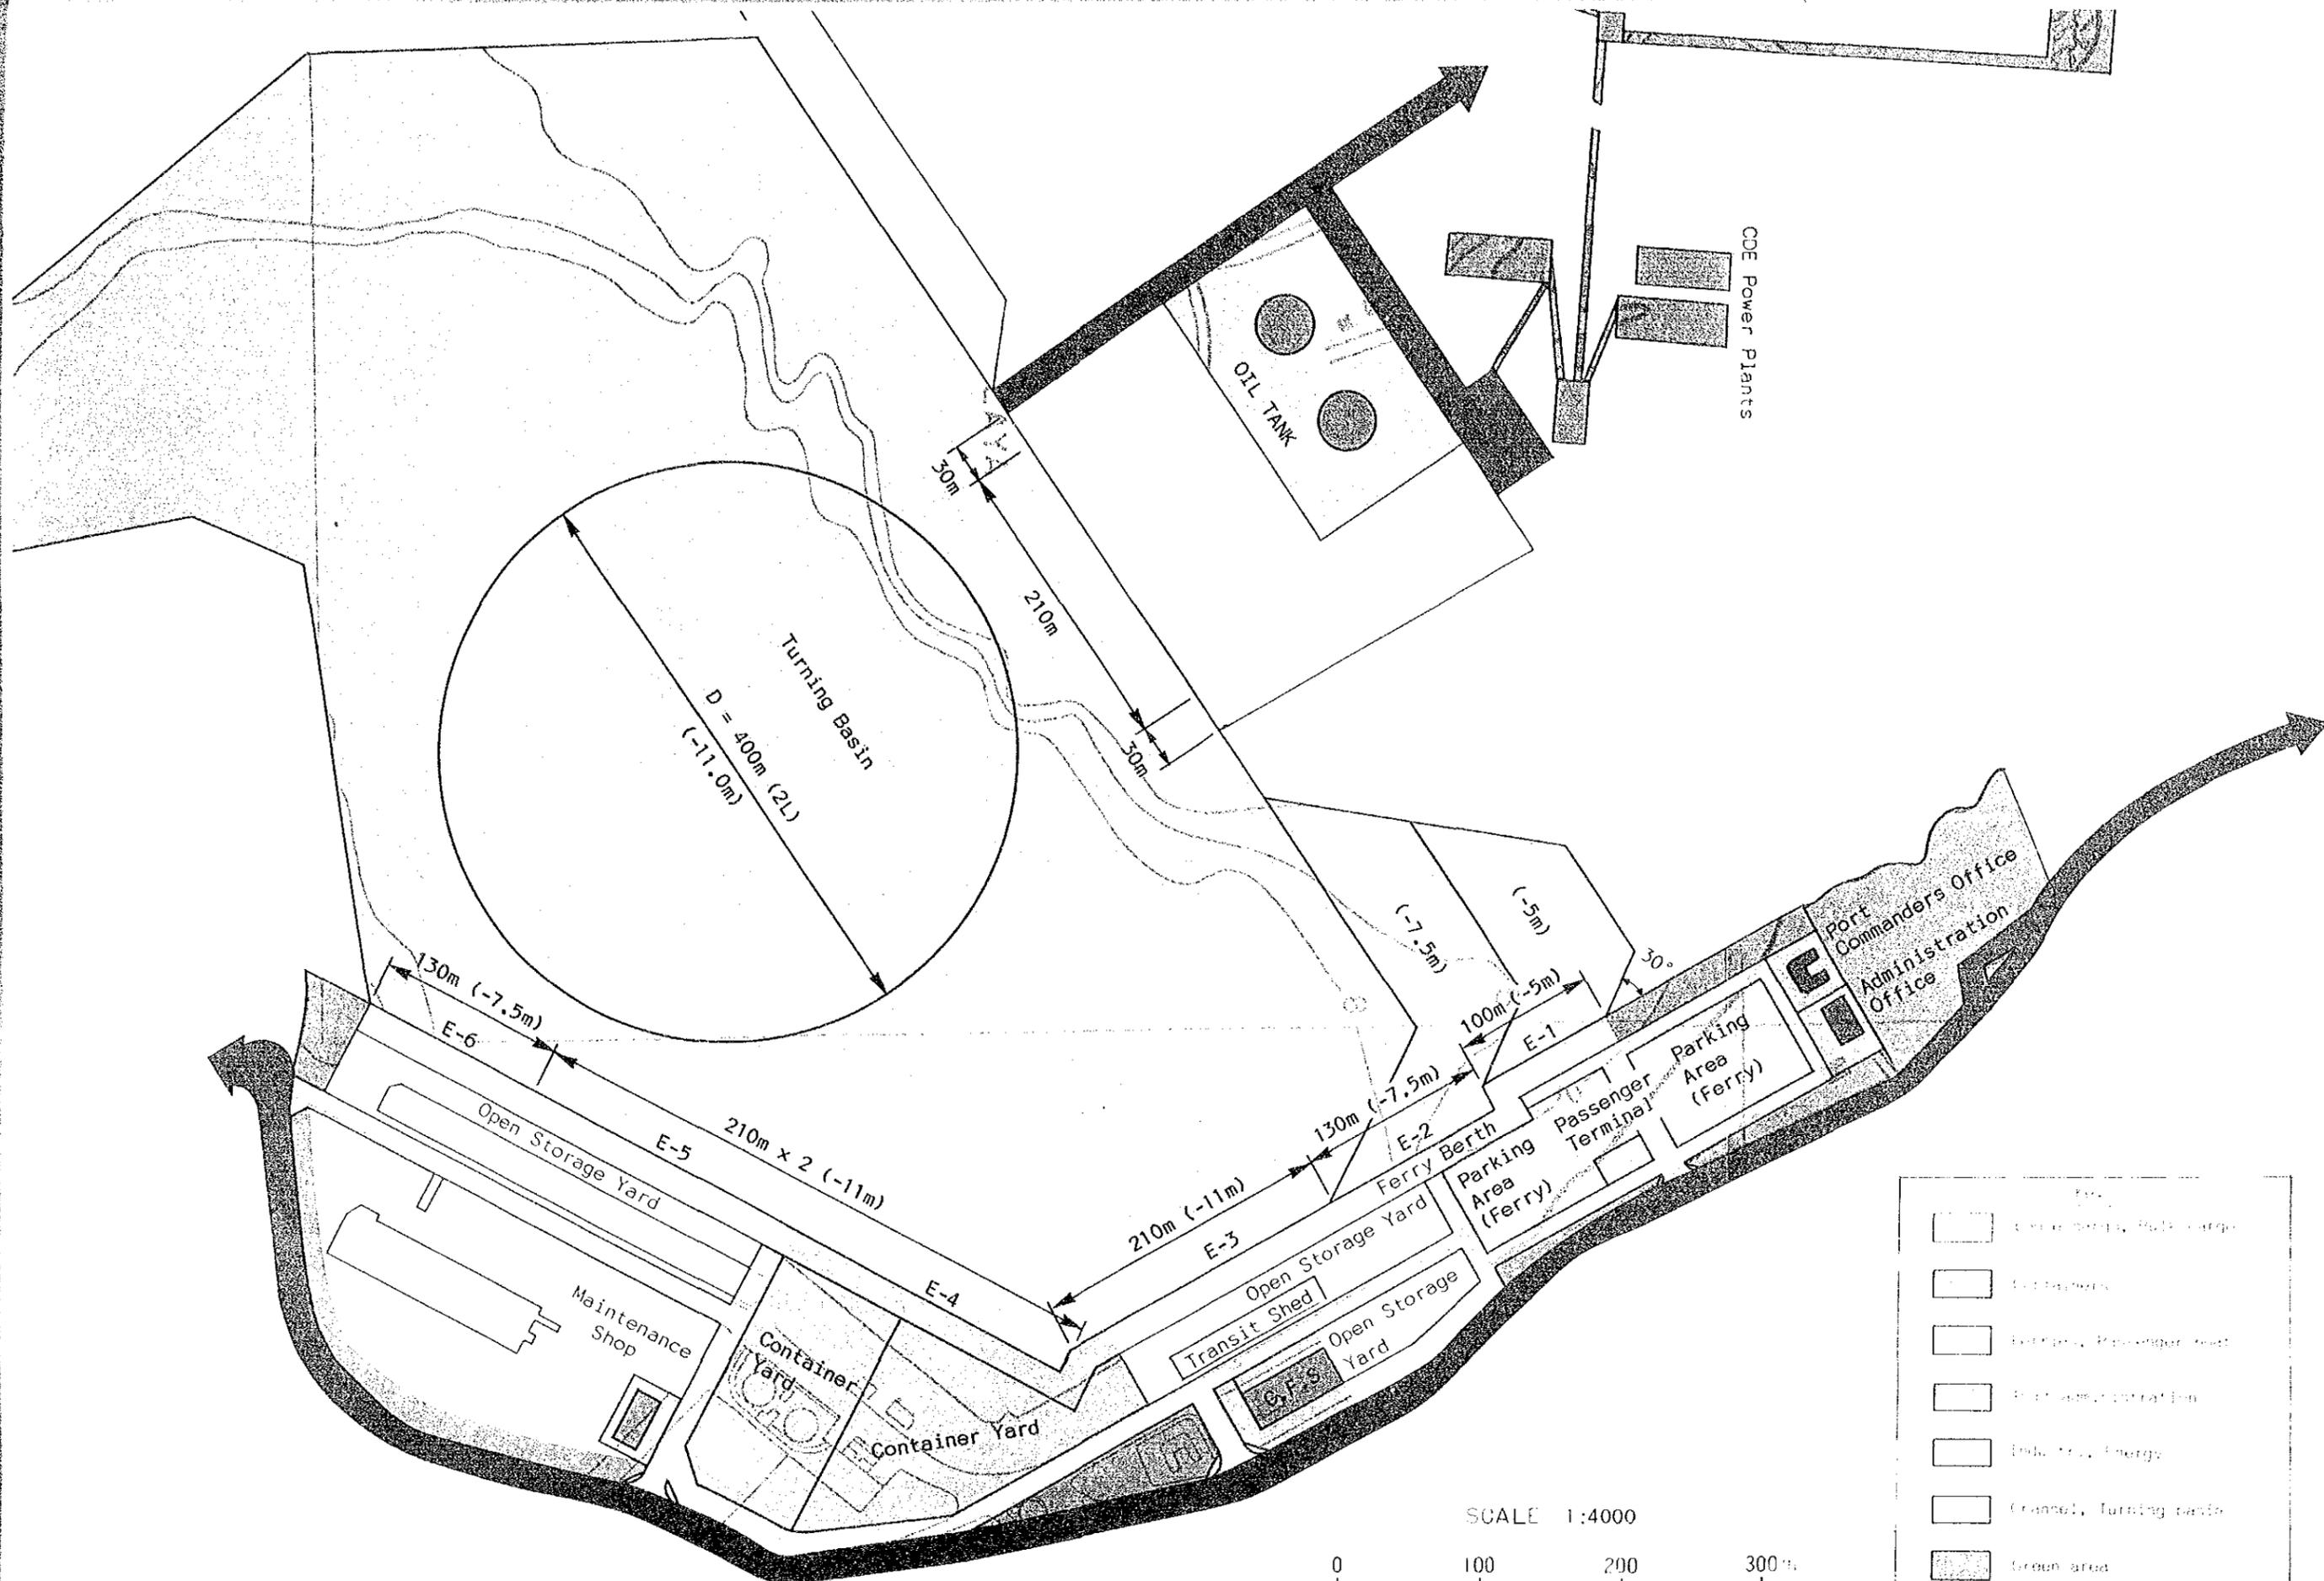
Layout of Port Facilities for the Master Plan
